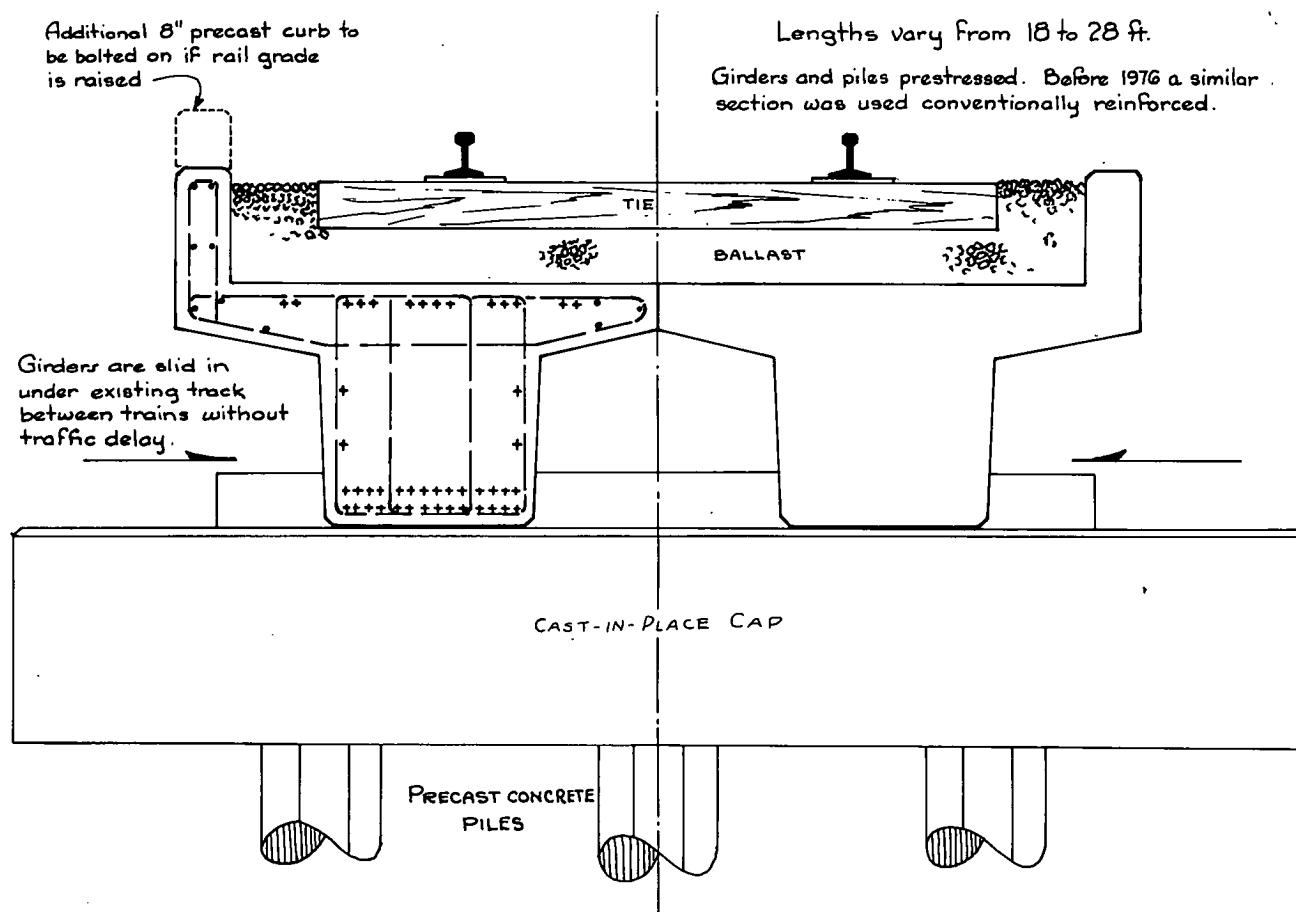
Precast concrete trestle replacement girders (Missouri Pacific RR).
